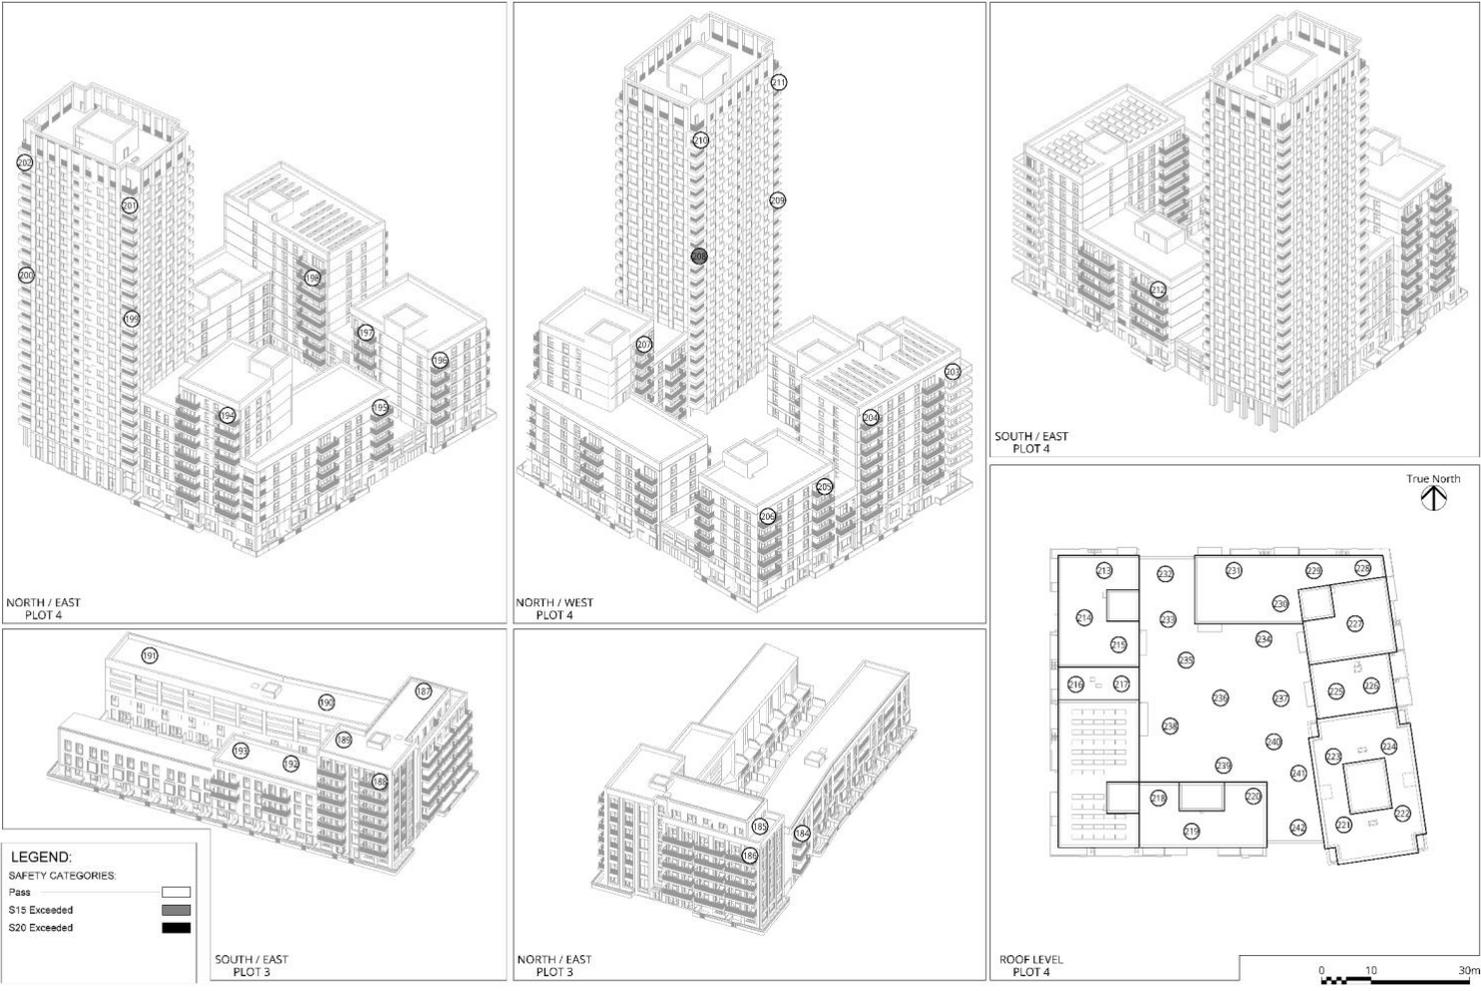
Configuration 2: The Project (Plot 03 and Plot 04) with Extant Planning Permission Site and Existing Surrounding Buildings – Elevated levels (strong winds)
